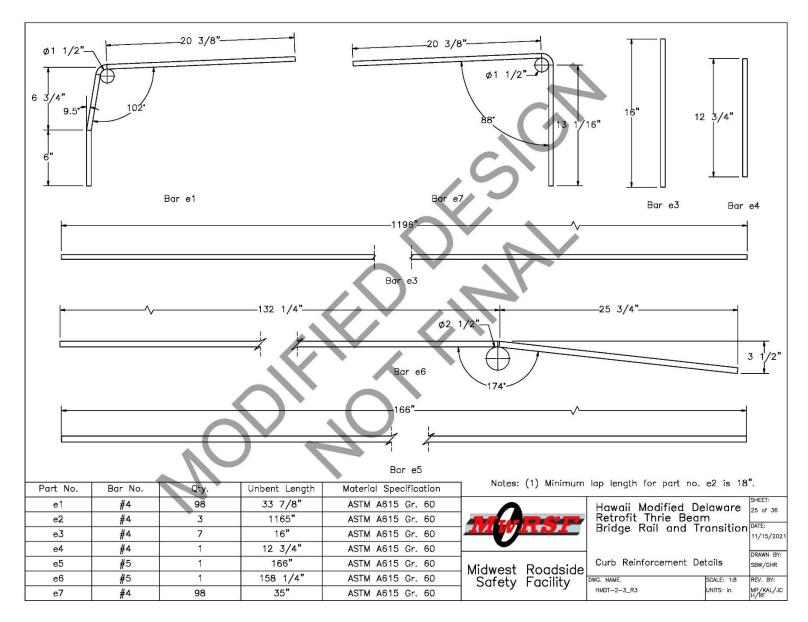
Curb Reinforcement Details, Test Nos. HMDT-2 and HMDT-3
